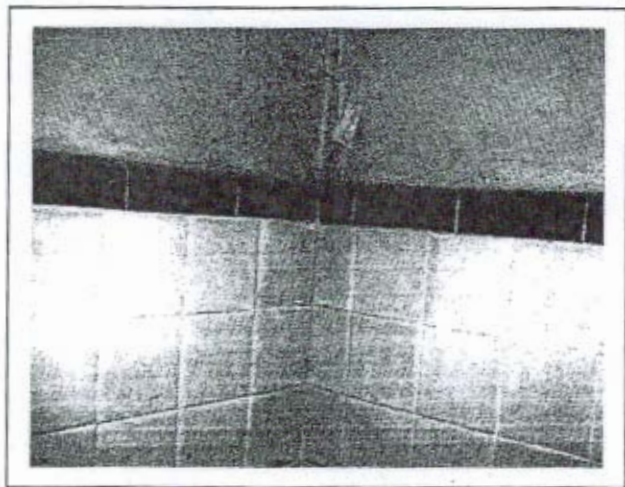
Viewing green 4" wall tile, Basement - SE room.
